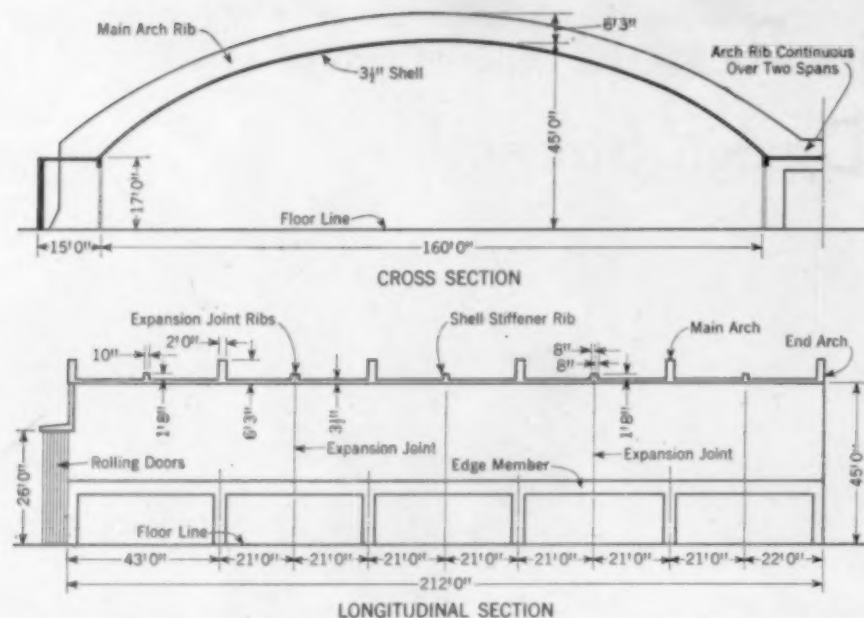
THIN ROOF SHELL which spans between, and is stiffened by, continuous arch frames has $3\frac{1}{2}$ -in. thickness except where framed into supporting arches.
